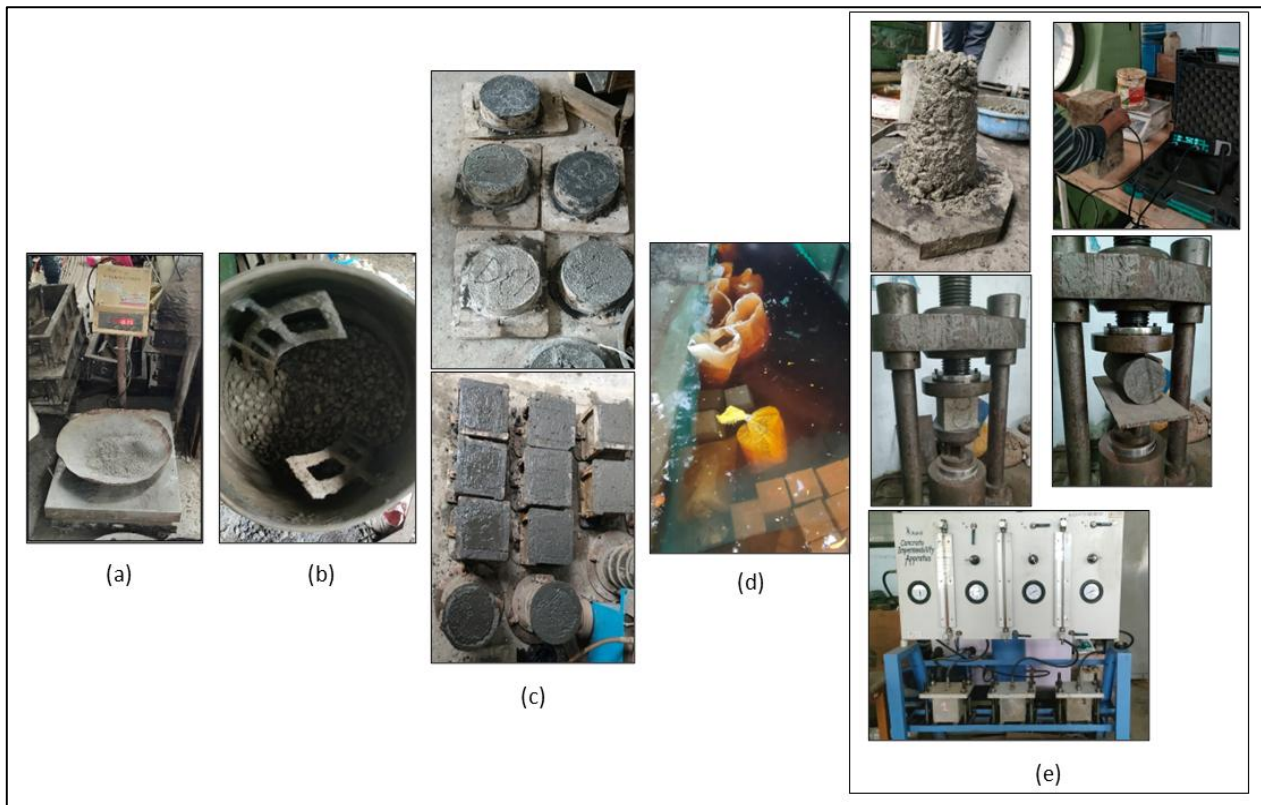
(a) Weight batching (b) Mechanical mixture (c) Casted specimens (d) Curing of specimens in tank (e) Testing of specimens by using different apparatus
